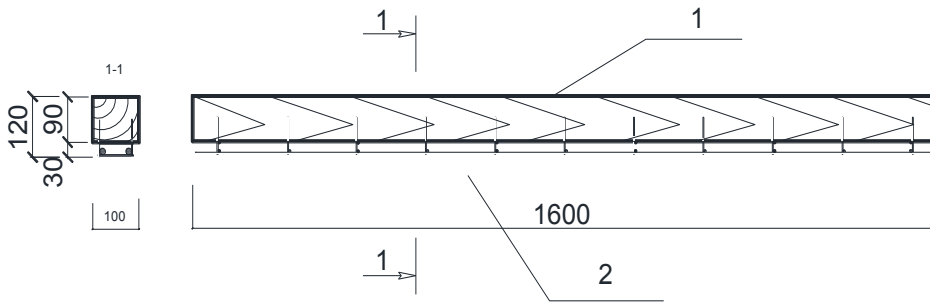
Wooden beam with steel cage frame. Where: 1- wooden beam, 2- steel cage frame (SNKR-1).
